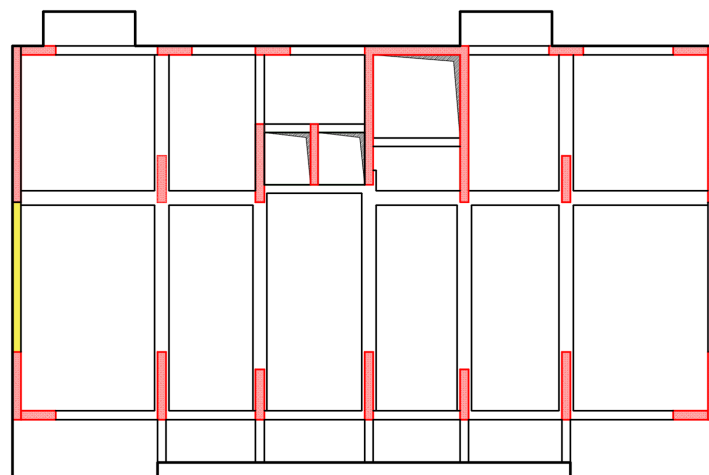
Floor plan showing the location of the critical beam highlighted with yellow (Story 7, axis A see figure III.2 for the full floor plan).
